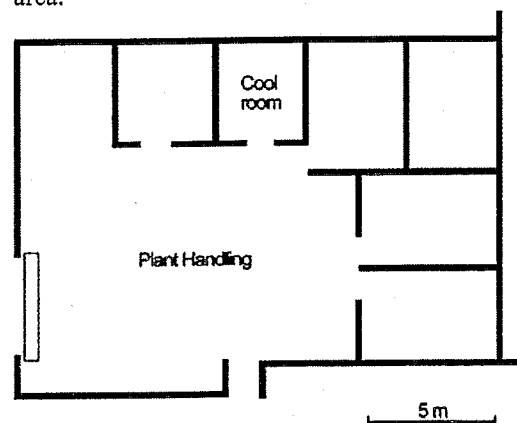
Floor plan of initial facility treated. Unmarked rooms were used for storage. Office and laboratory facilities were above and adjacent to treatment area.
